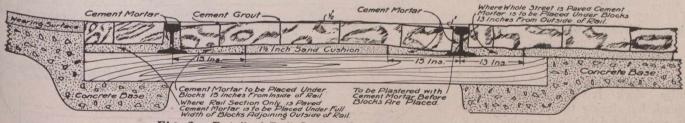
Detail of Rail Section for Granite Block Pavement.
